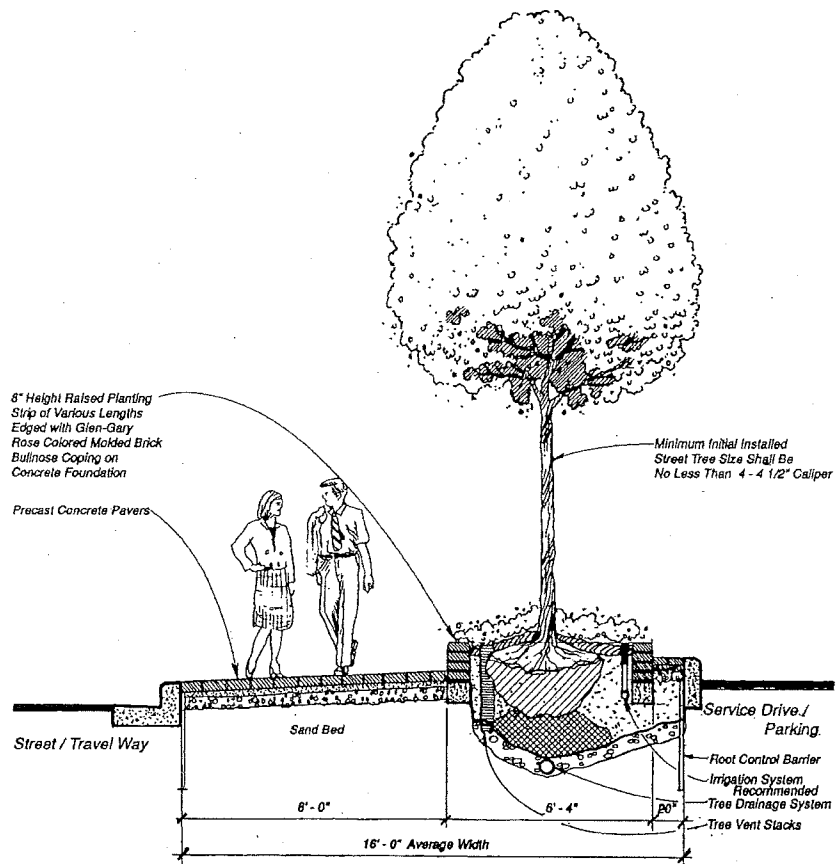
Typical Streetscape Module Section - One Row of Trees
